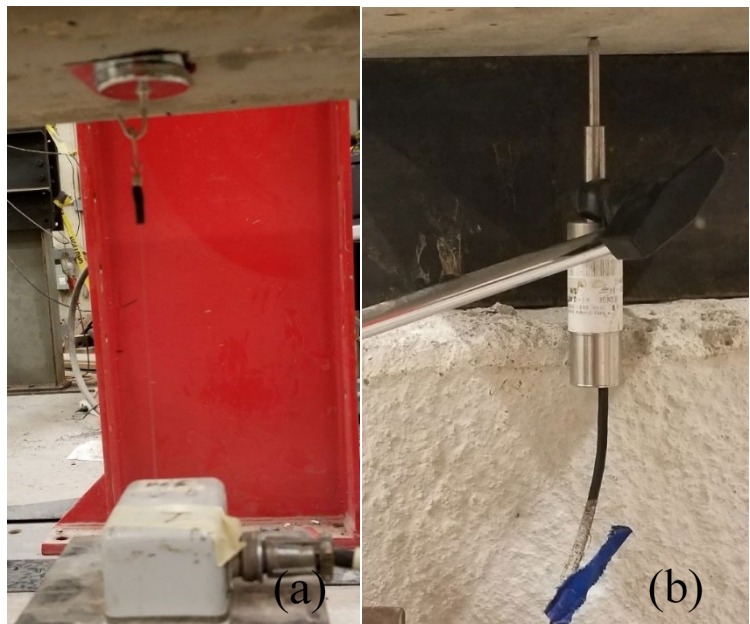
Wire potentiometer (pot) attached to bottom of girder at midspan (a) and linear voltage differential transformer (LVDTs) placed under girder near the support (b).
